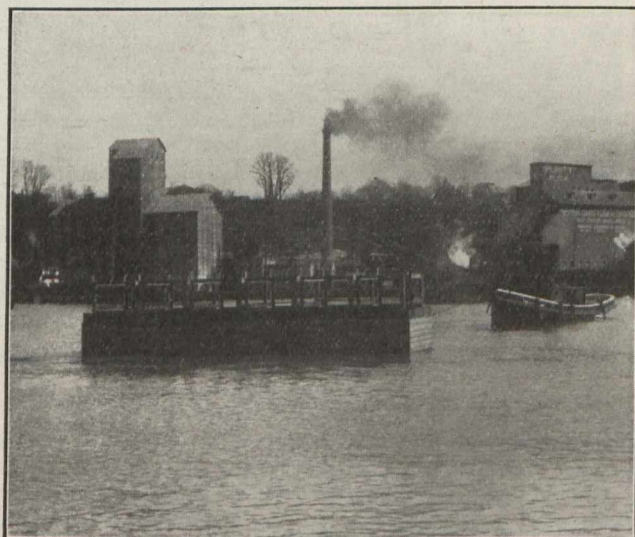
shows the crib work being floated to the dock to receive concrete.
